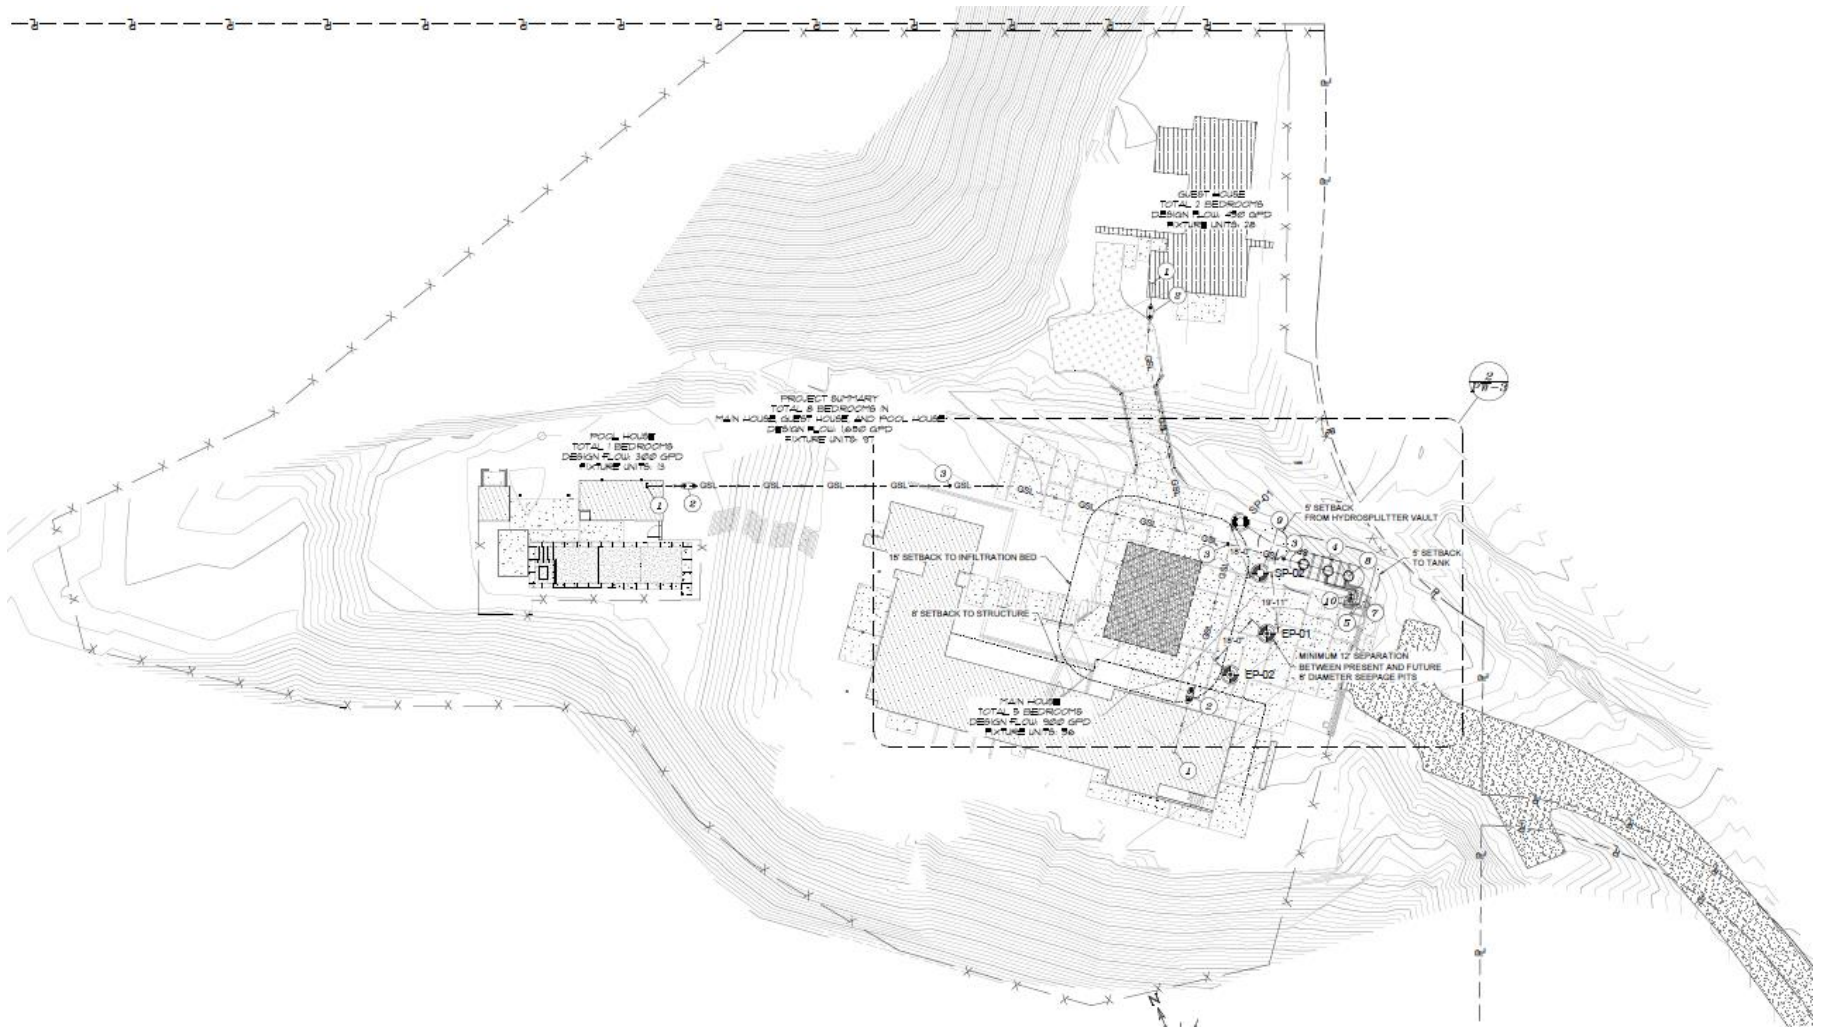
Site Plan of the Single-Family Residence and Advanced Onsite Wastewater Treatment System
